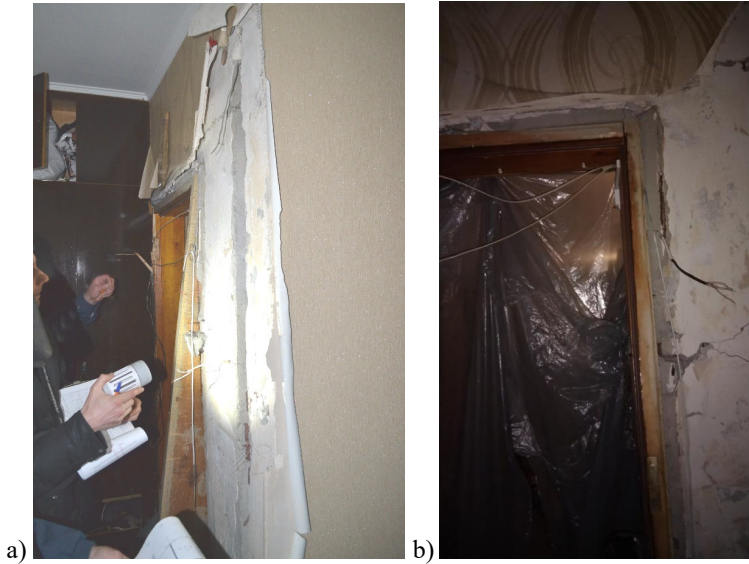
(a, b) – Deformation, departure from the design position of the reinforced concrete block of the doorway of the apartments, which overlook the staircase of the apartment in which the explosion occurred
